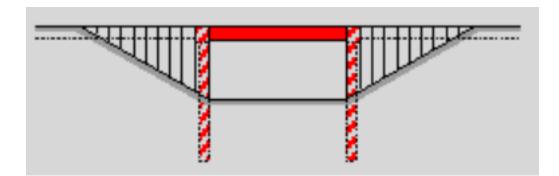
A single span bridge with wall-type abutments (LUSAS, 2014)
